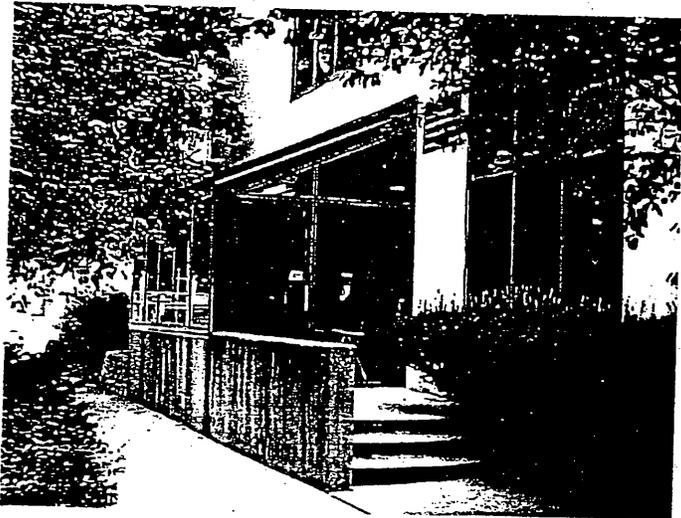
The concrete wall is badly stained at west atrium. The leakage problem has been alleviated.
